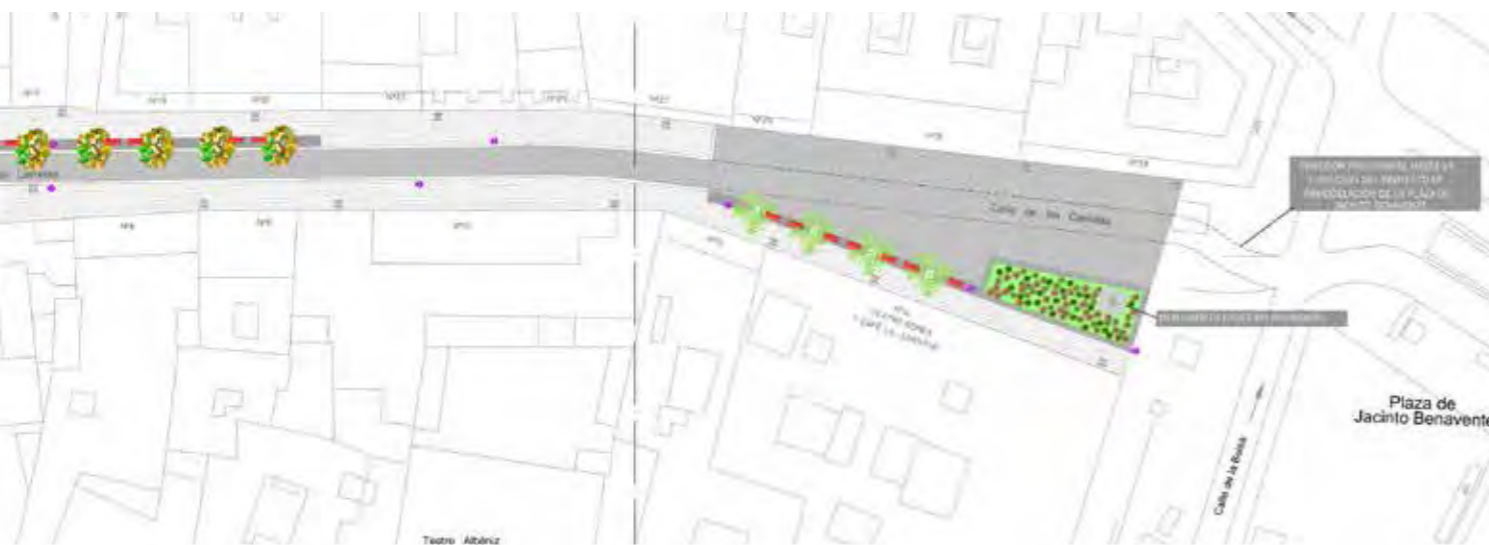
Plan of the remodelling project from Calle de Carretas. Sections 1 and 2 - Source: Ayuntamiento de Madrid
